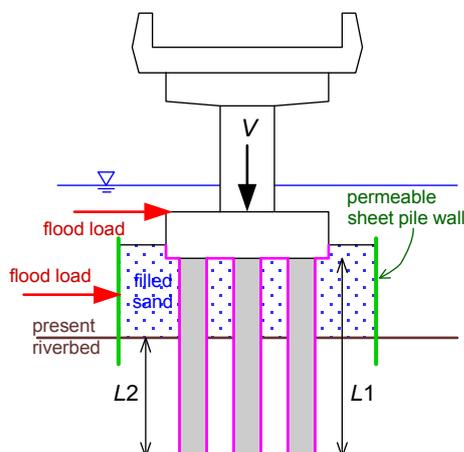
A concept of Sheet Pile Wall (SPW) reinforcement method.
